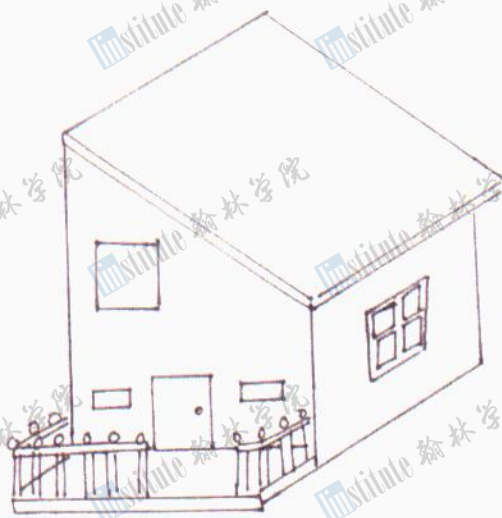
| A typical Single Bedroom House. It is versatile, unique, and the perfect house for any singles or couples. One of the designs for a singles/couple house
